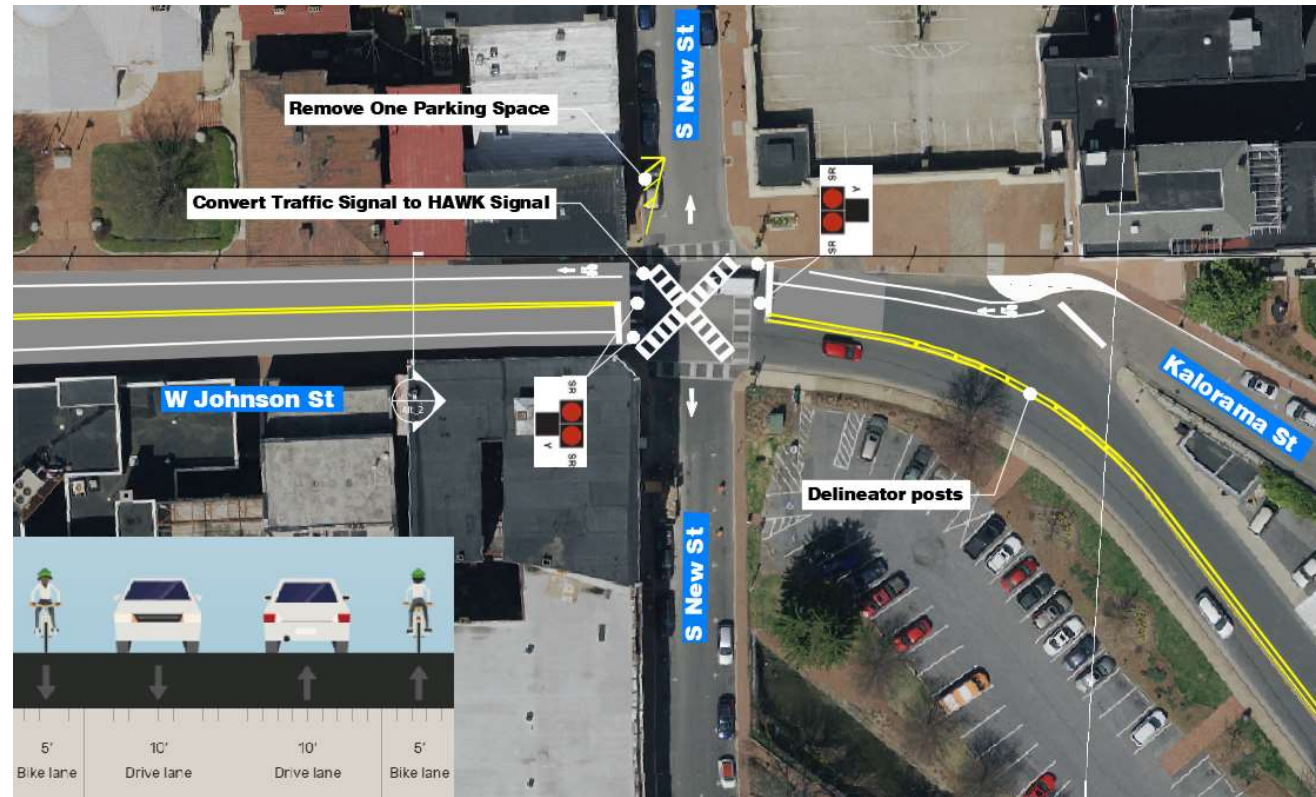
Alternative 2 Concept Sketch - West Johnson Street at South New Street
